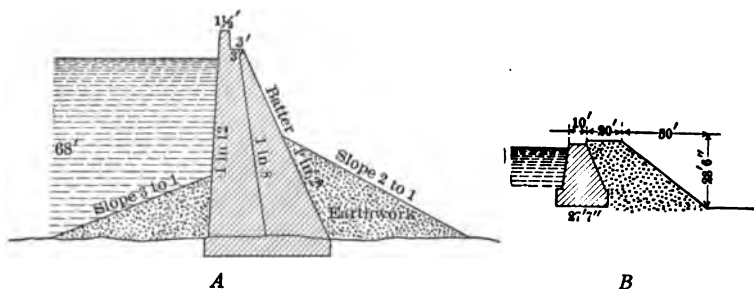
Cross-section of Kabra Dam (A) and Ekruk Dam (B), India.
